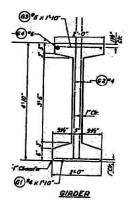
Bridge 5/649 Girder Detail
